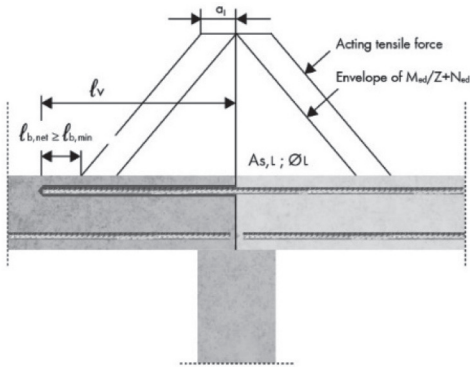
Anchoring of reinforcement to cover the line of acting tensile force
